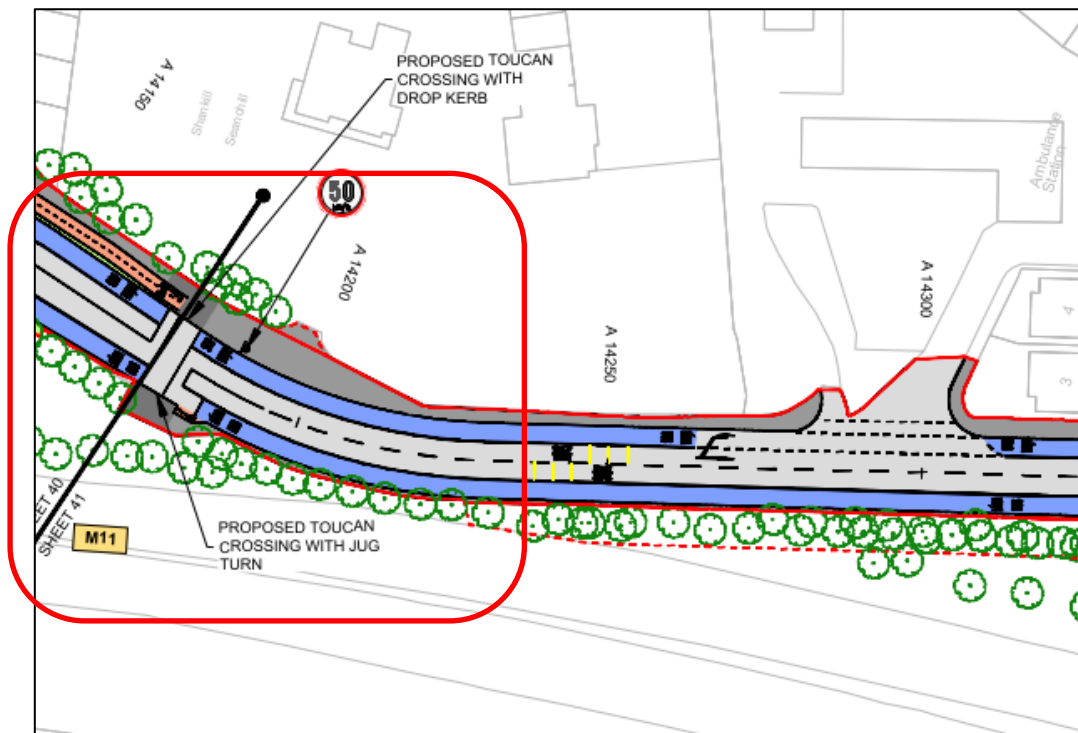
Extract from General Arrangement Drawing at Loughlinstown Roundabout (Sheet 41)
